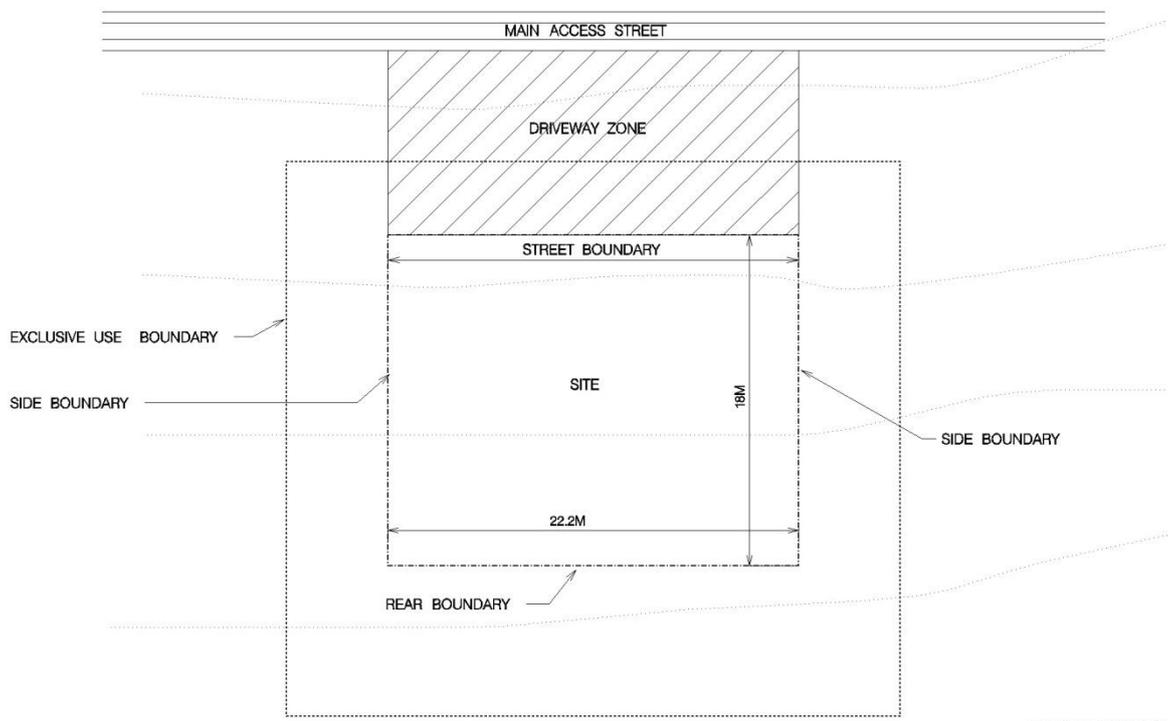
Typical Fynbos & Paddock Site – Driveway Access zone
